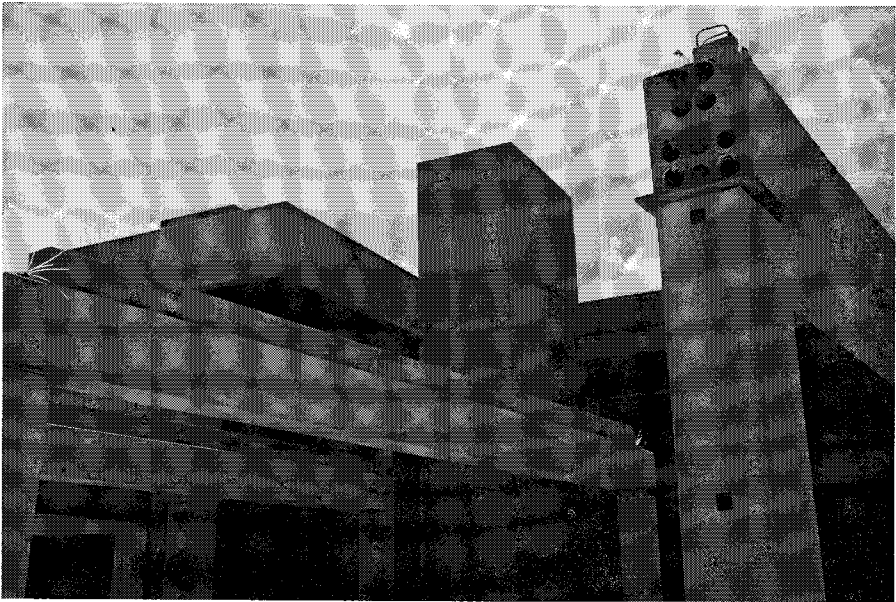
Deplaning structure 62-ft spans, 57 in. deep. 28-in. wide cast-in-place girders notched to receive 18-in. deep double tee sections. Post-tensioning was applied in two stages as superimposed load was applied. Vertical column dowels were sleeved and horizontal slippage surface under beam bearing was used to avoid inducing bending moment into columns when post-tensioning was applied.
